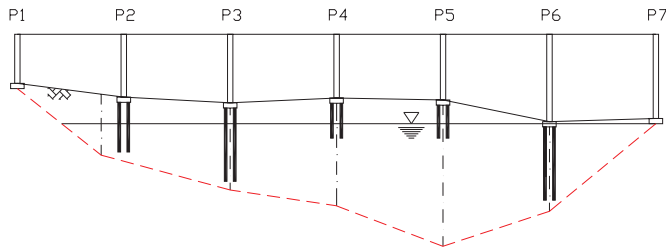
Piers and pile groups of Marga-Marga bridge.
